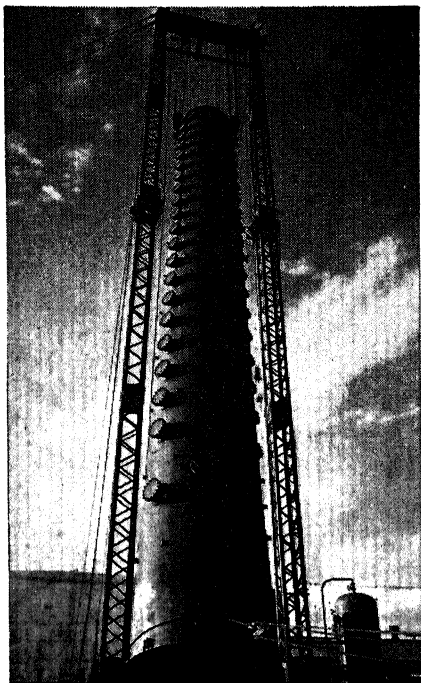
Arc welded fractionating column being erected at a refinery. 104 ft. long. 126-in. diameter.
